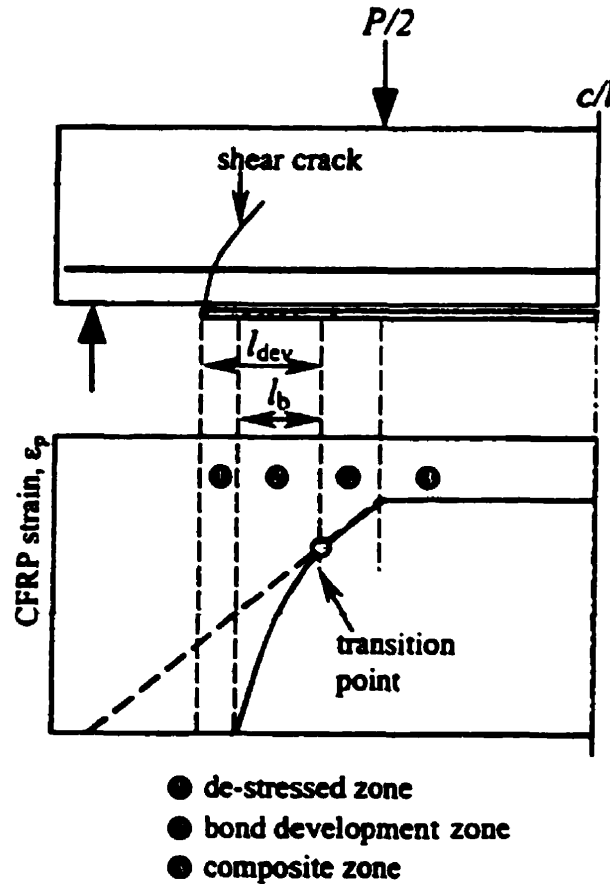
Composite model of concrete beam bonded with FRP plate [17]
